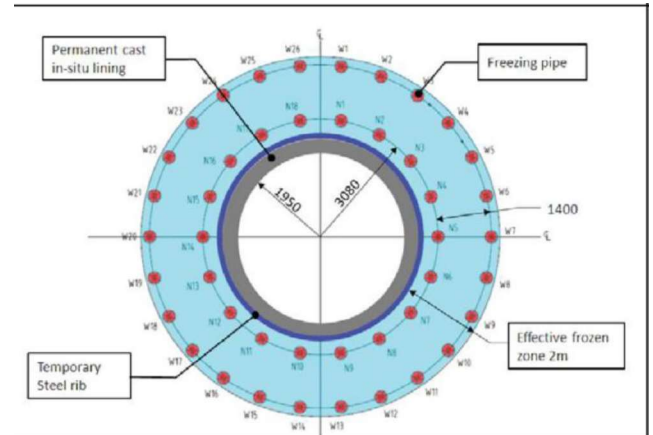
Tunnel temporary support and horizontal freezing pipe layout (after Tsang et al. 2012)
